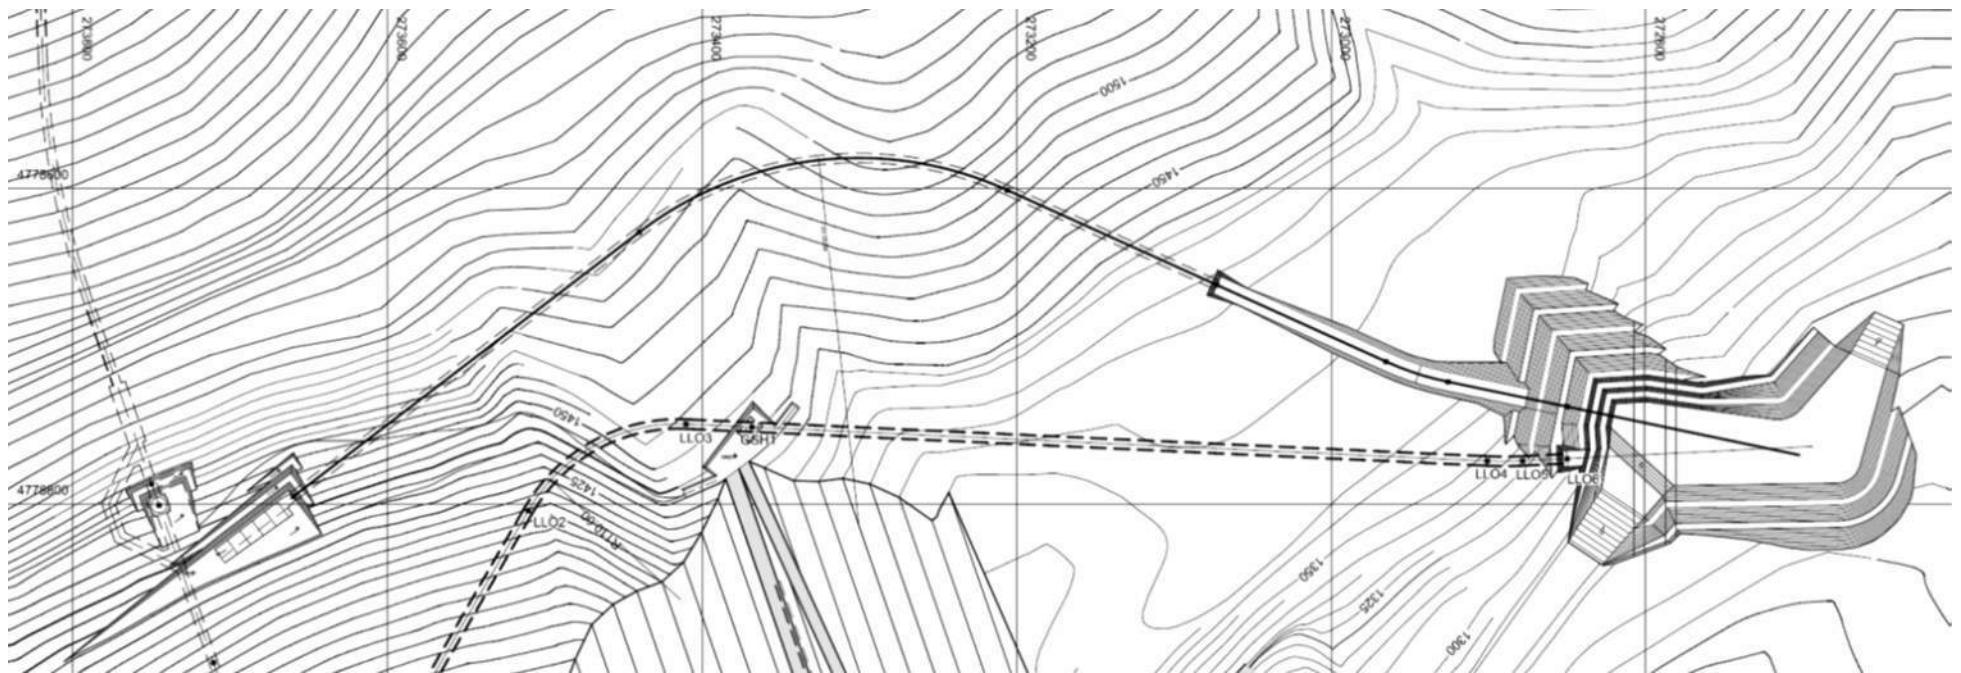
Layout plan of control-measuring systems of Nenskra dam
